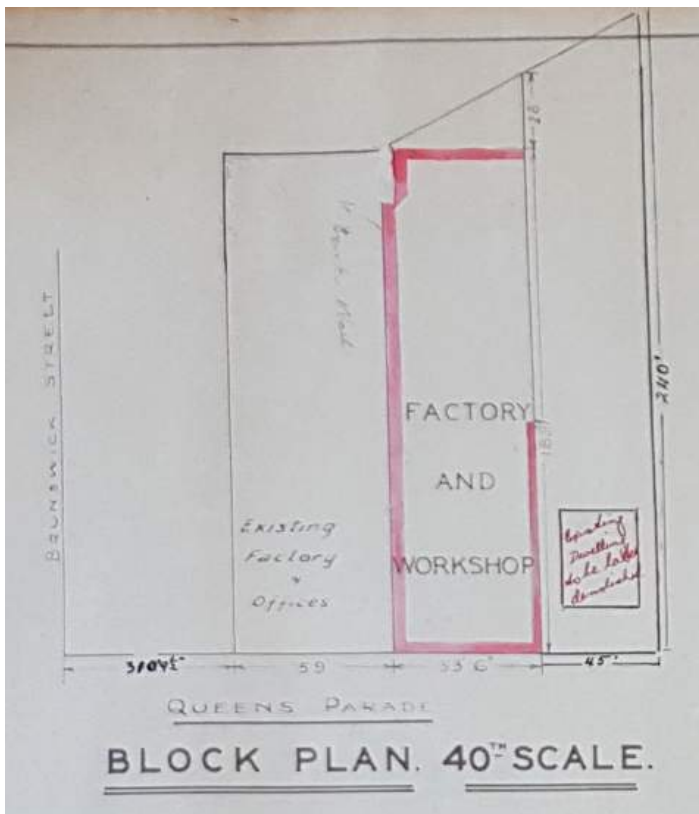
1937 drawings – showing the existing factory and offices, being the double-gabled roof building with a 59' (approx 18m) frontage to Queens Parade. The 1937 addition is located to the east (red) (PROV, 1937).
